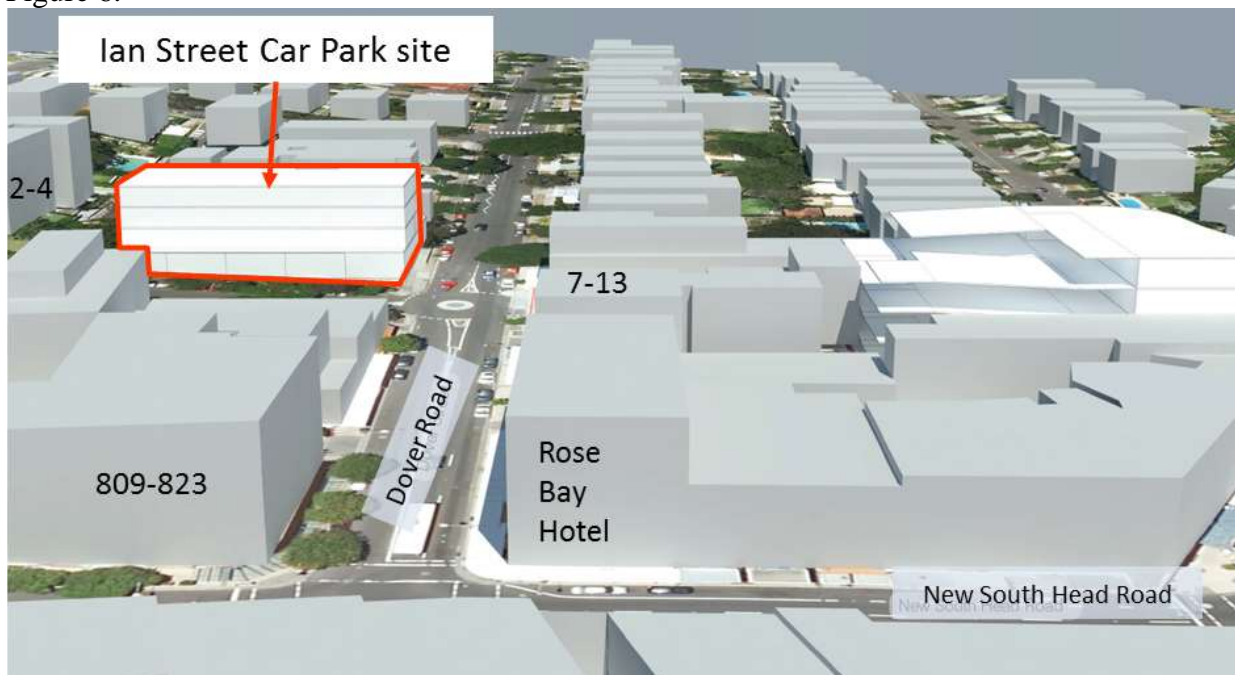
3D view of the Ian Street Car Park site facing south east showing the concept for the site compared to existing buildings in the Centre
